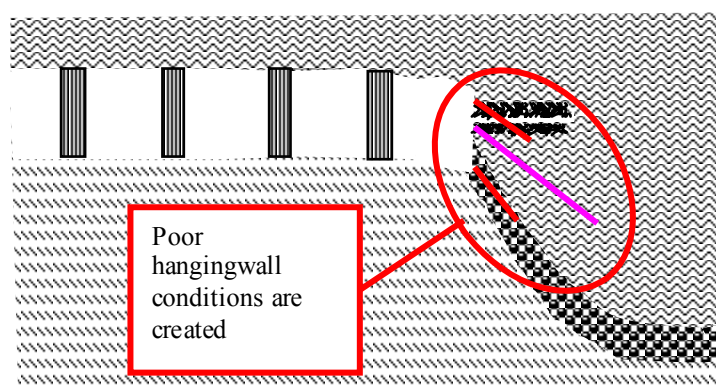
B: Continuous drilling into the hanging wall lavas while negotiating the roll creates poor hanging wall conditions.
